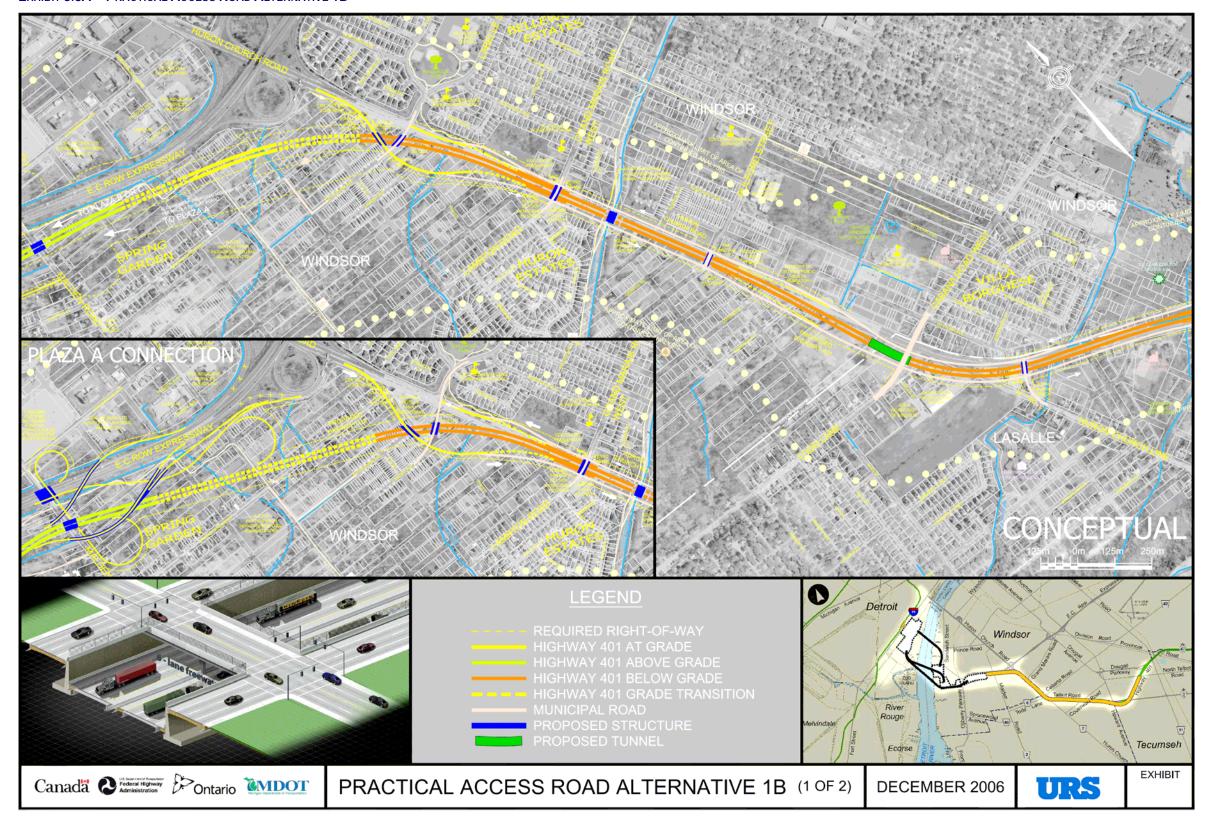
B - PRACTICAL ACCESS ROAD ALTERNATIVE 1B
